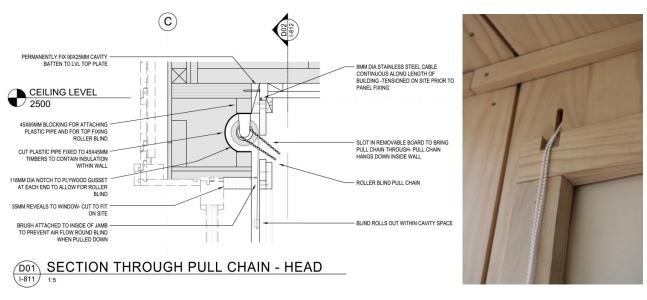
Detail for getting blind pull cord through the removable lining panel and (right) photo of constructed detail
